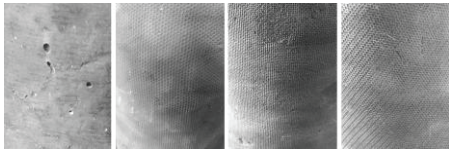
Concrete surface texture: a) metal mold b) polyester mold, c) polypropylene (a) mold, d) polypropylene (b) mold.
